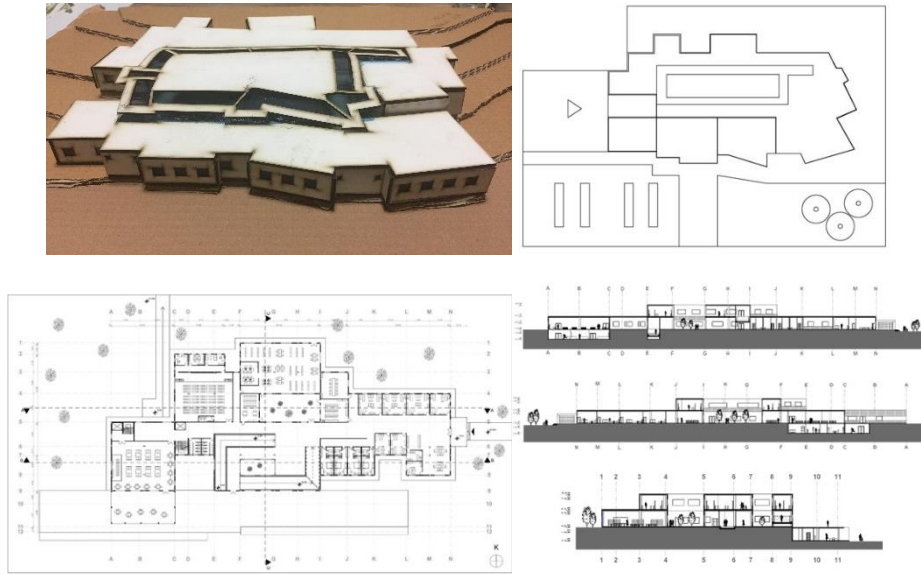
The questionnaire form II: The model, the layout plan, the interior plans and the sections of Project II
